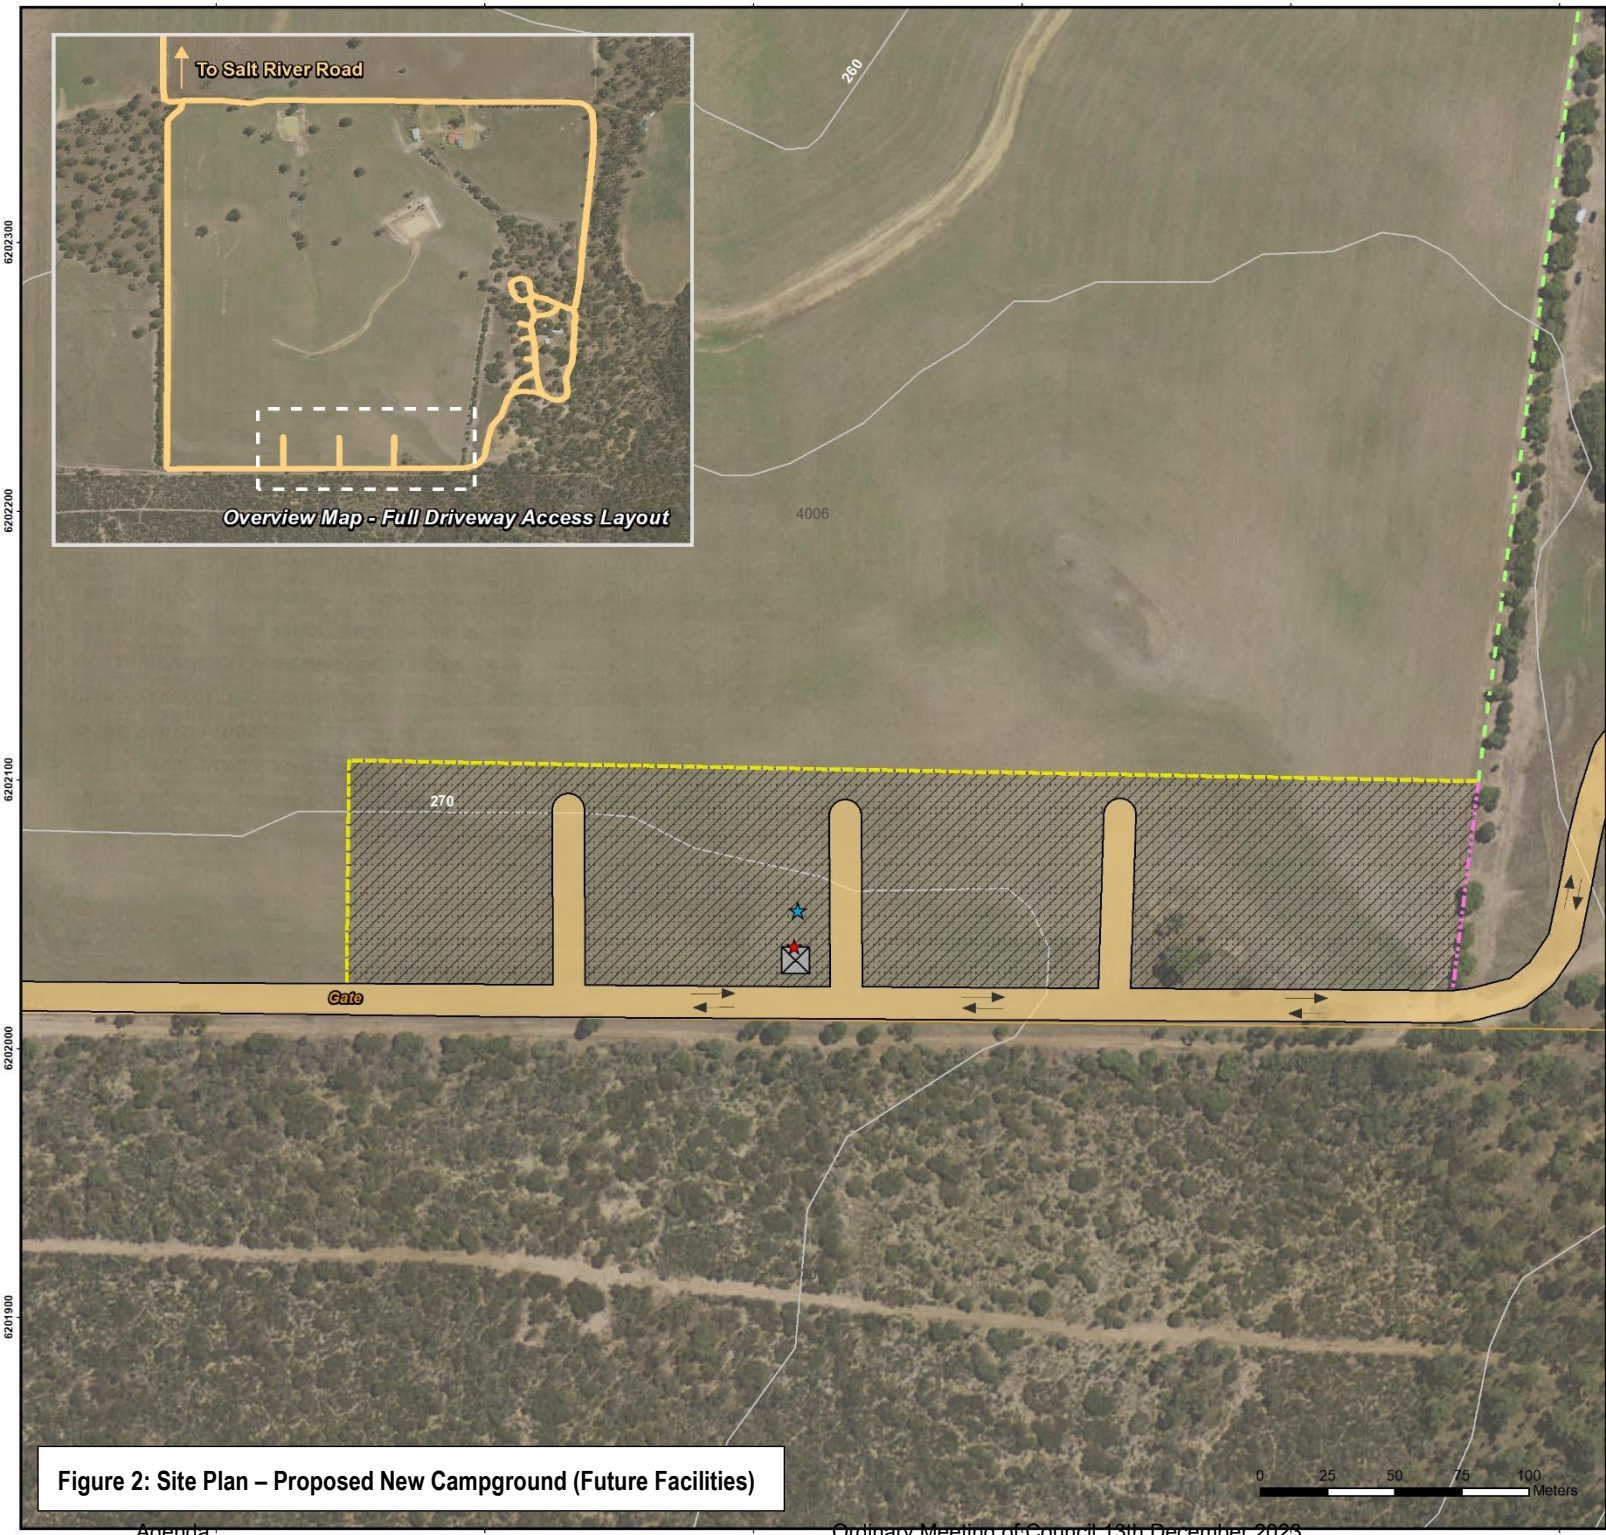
Site Plan – Proposed New Campground (Future Facilities)
